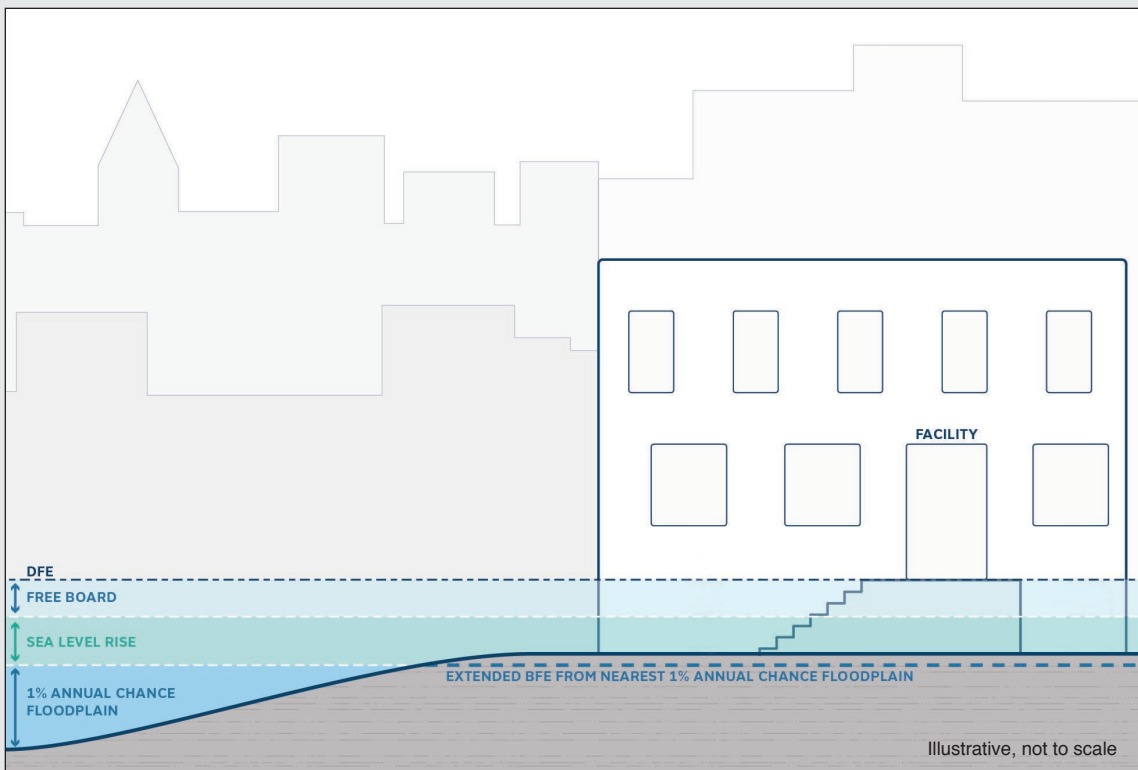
This schematic shows how to use a base flood elevation in the current floodplain, with sea level rise and freeboard, added, to determine a design flood elevation for a facility located in the future floodplain.
